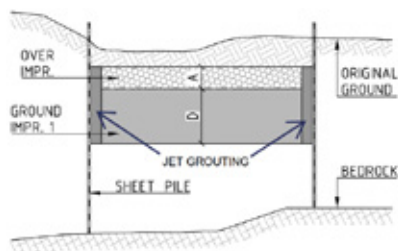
left: Joint Sealing for a strutting slab by using Dry Deep Soil Mixing (LCC) and Jet Grouting
